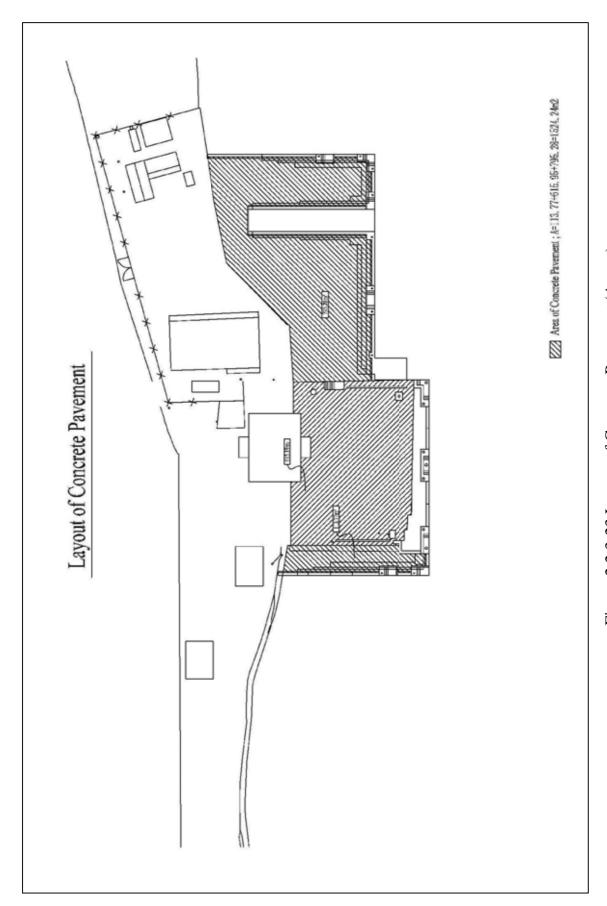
Layout of Concrete Pavement (Apron)
